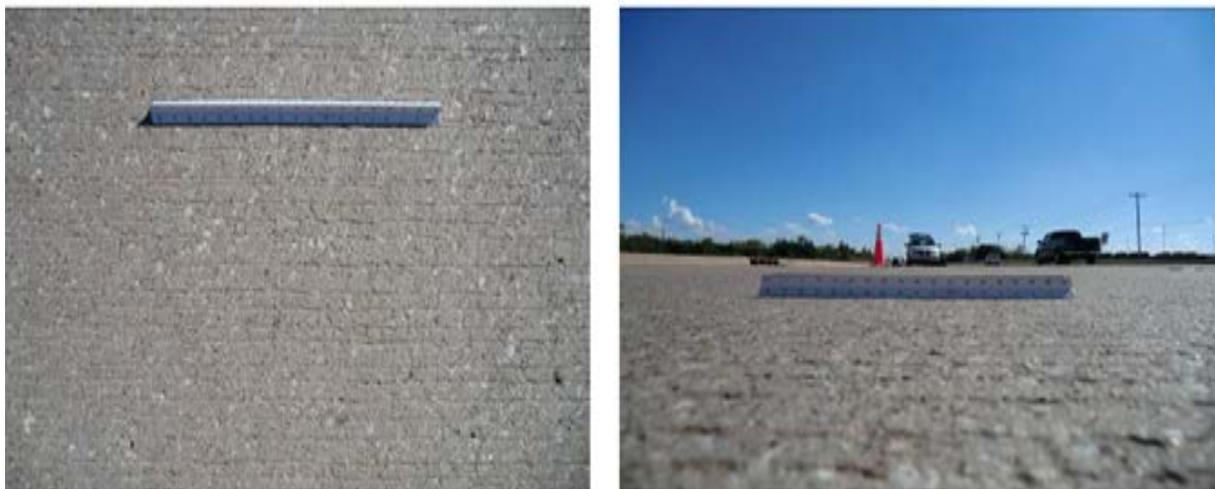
Plan (left) and Elevation (right) Views of DOS on Concrete Pavement (Riemer et al. 2010)
